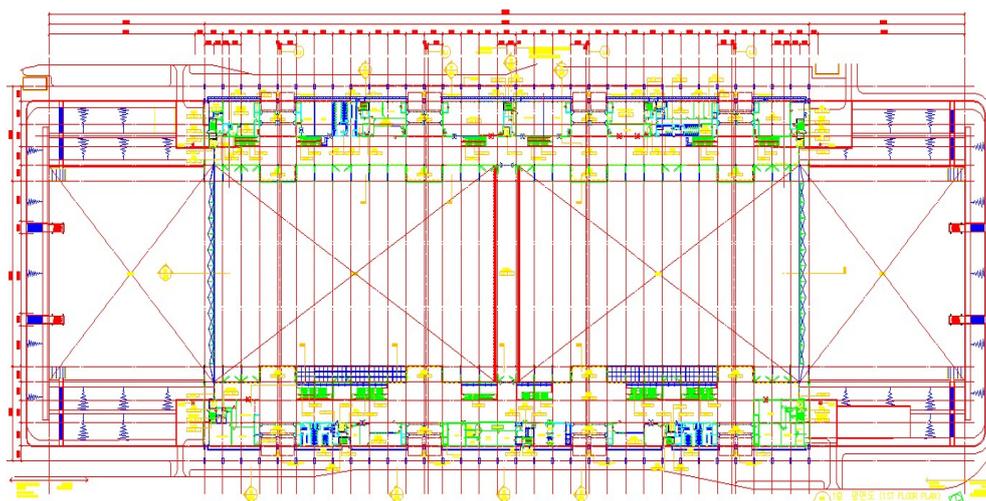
A construction drawing of 1<sup>st</sup> floor at Gwangmyeong station
